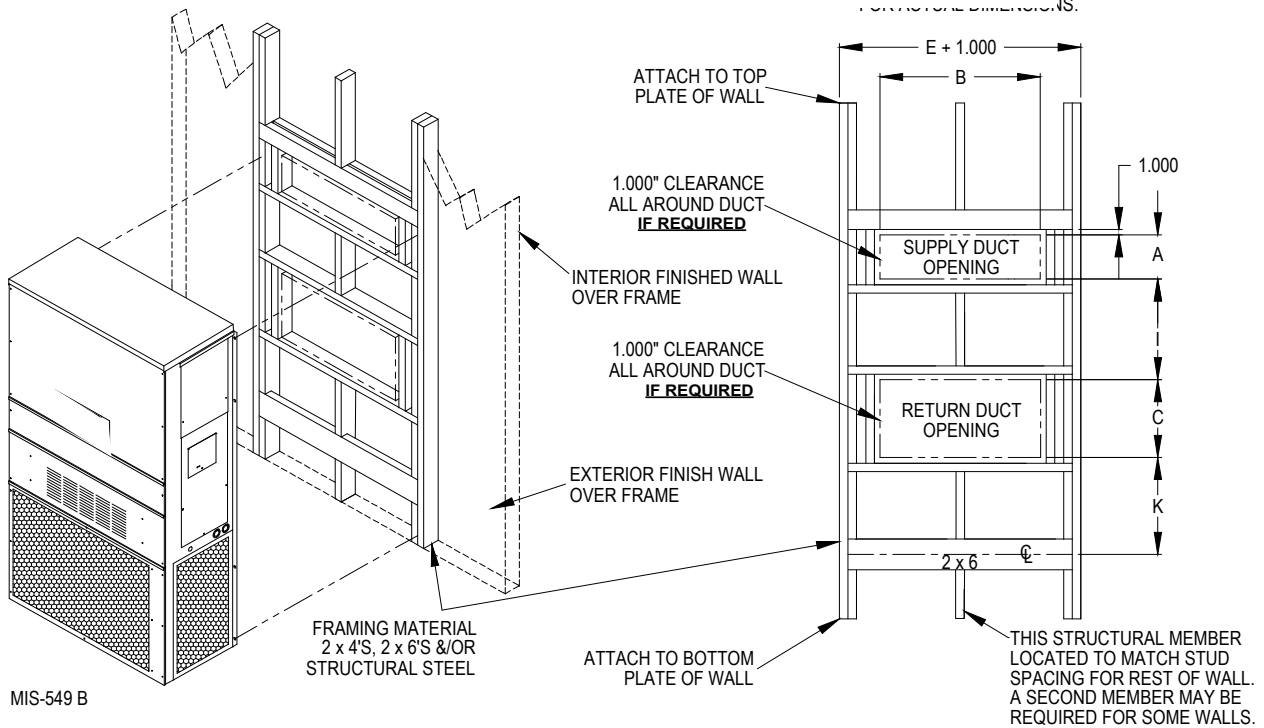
WALL MOUNTING INSTRUCTIONS
